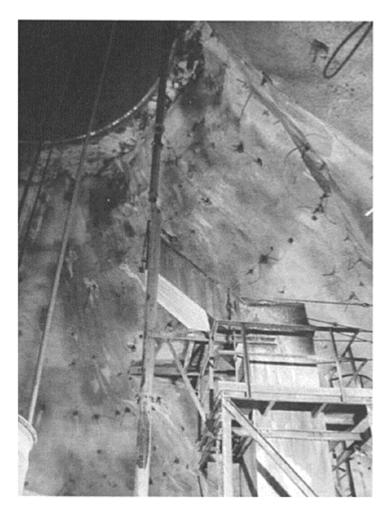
View of slick line transporting the ore pass lining concrete down the shaft.
